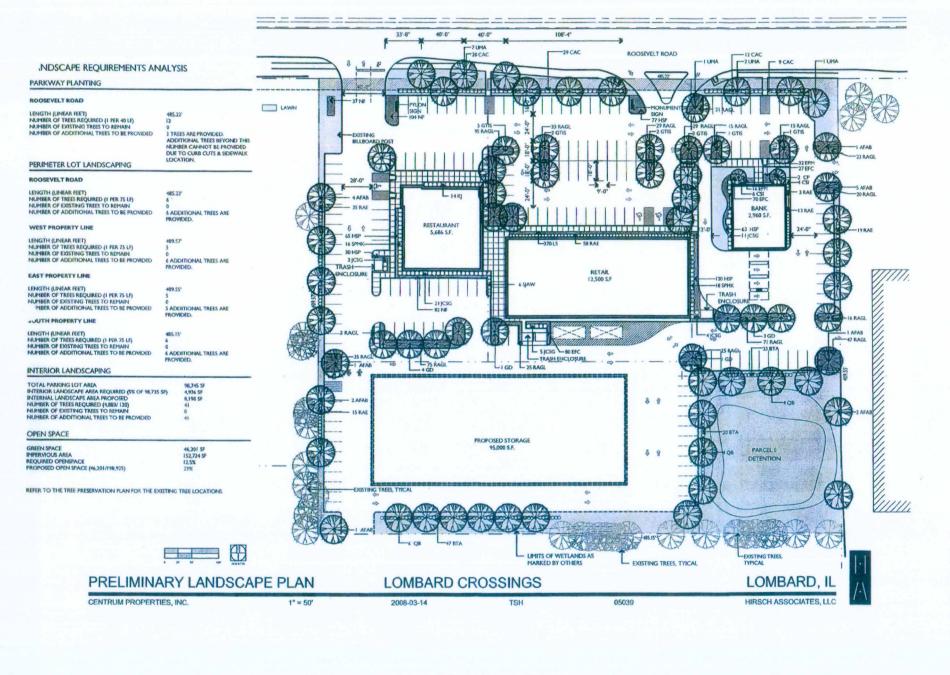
EXHIBIT E: PRELIMINARY LANDSCAPE PLAN
